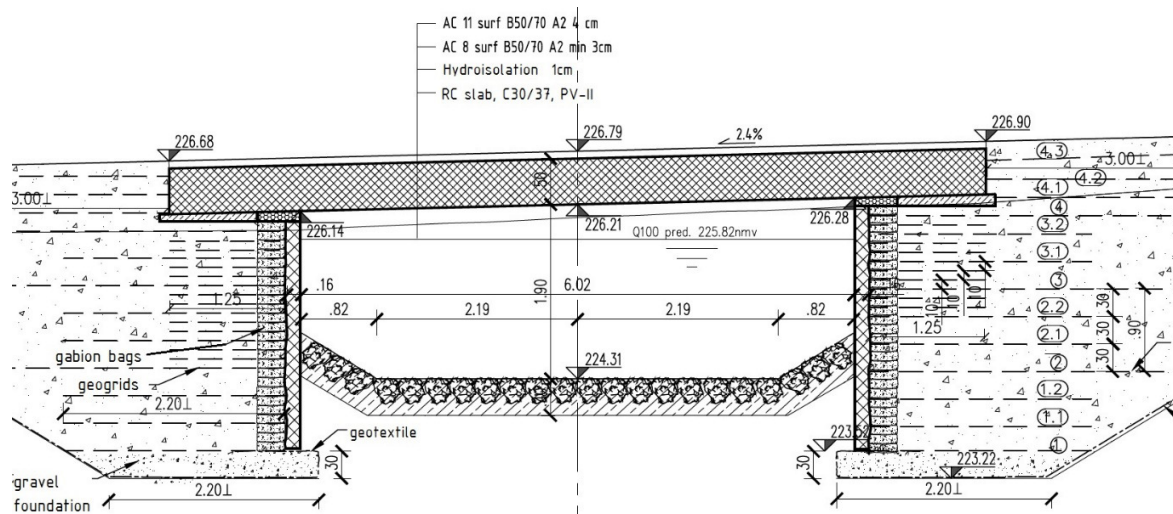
Cross-section of new designed bridge supported by reinforced soil abutments
